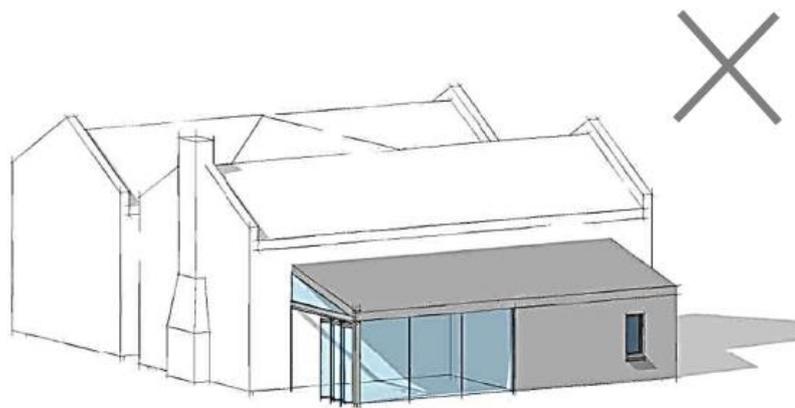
Example of a half walled and half glazed verandah. Not permitted.
